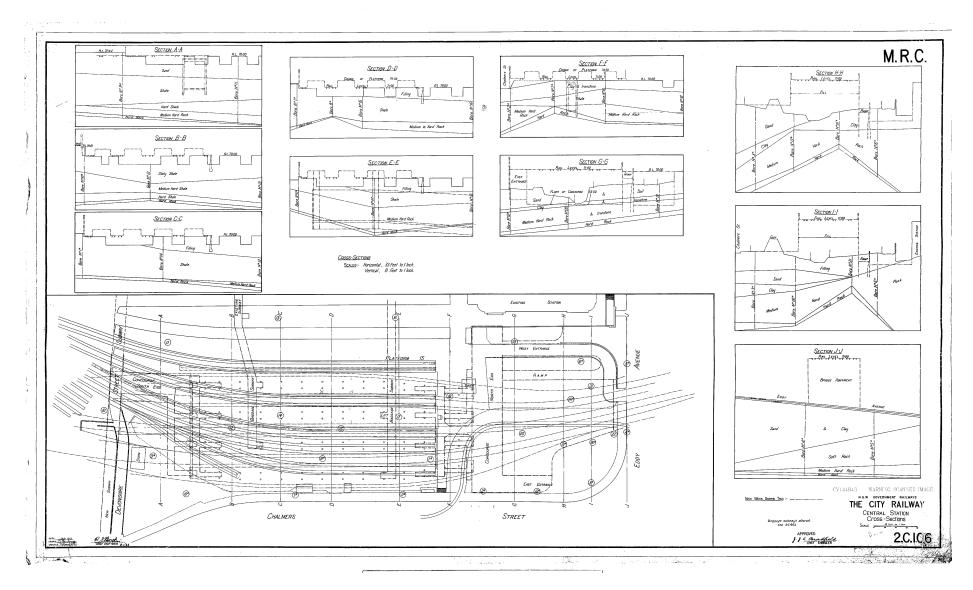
NSWGR Plan of Central Station Suburban Platform design 1922
